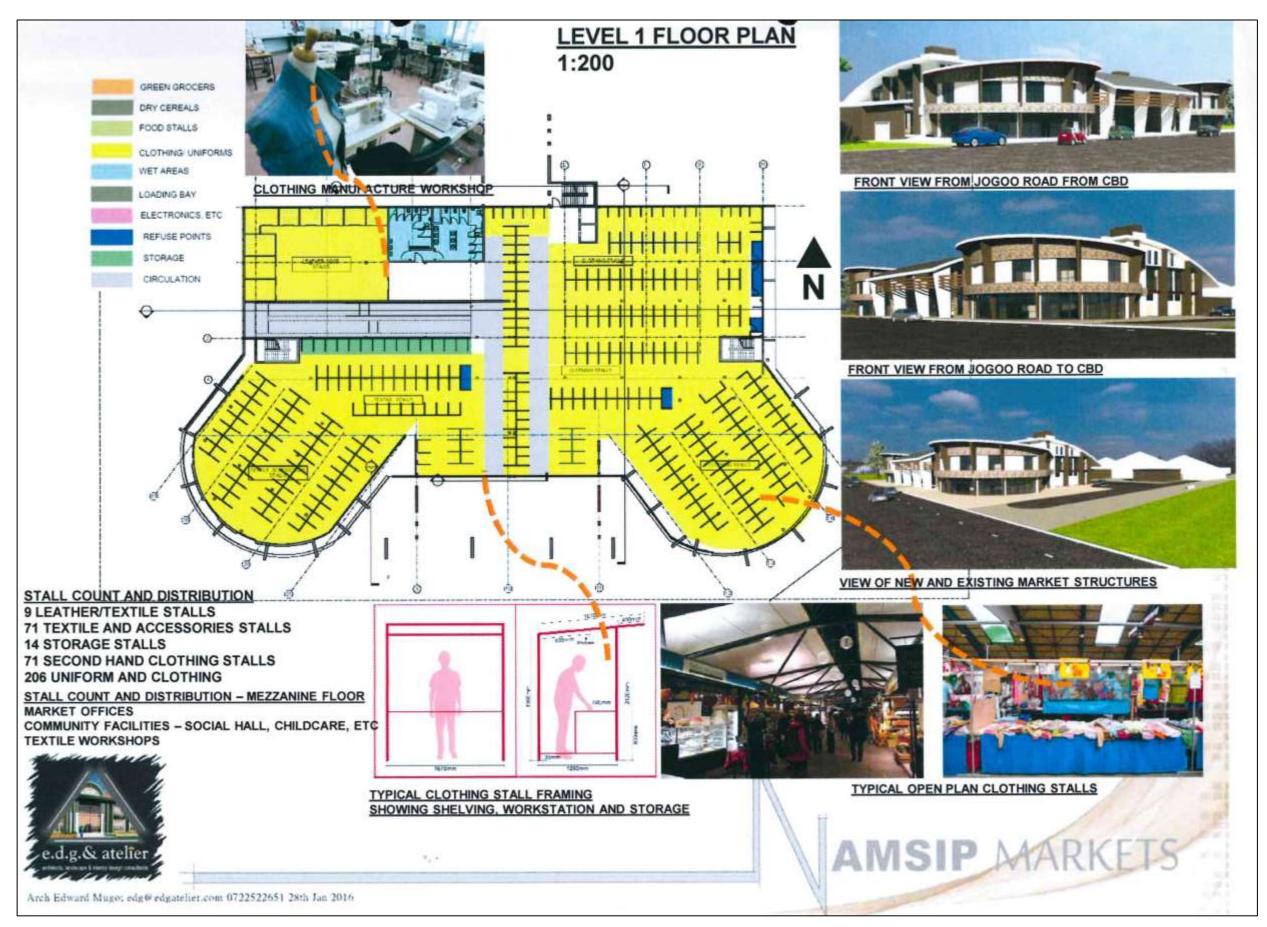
Proposed Level 1 Floor Plan for Jogoo Road Market Complex
